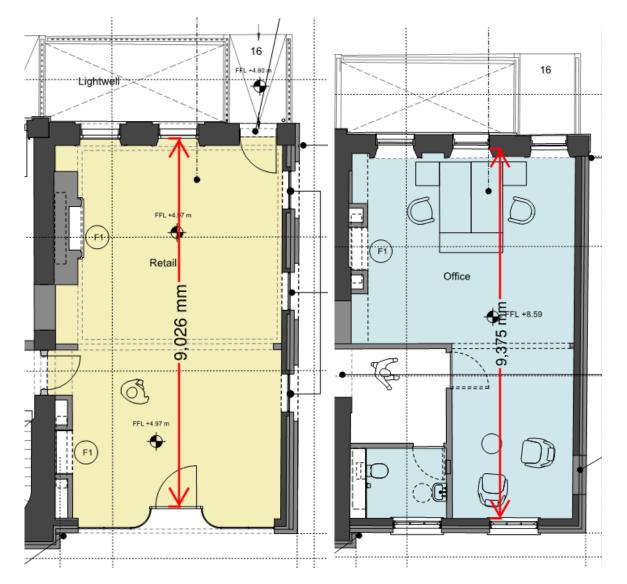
Typical Retail and Office floor plate in Keats House for Units 16.
